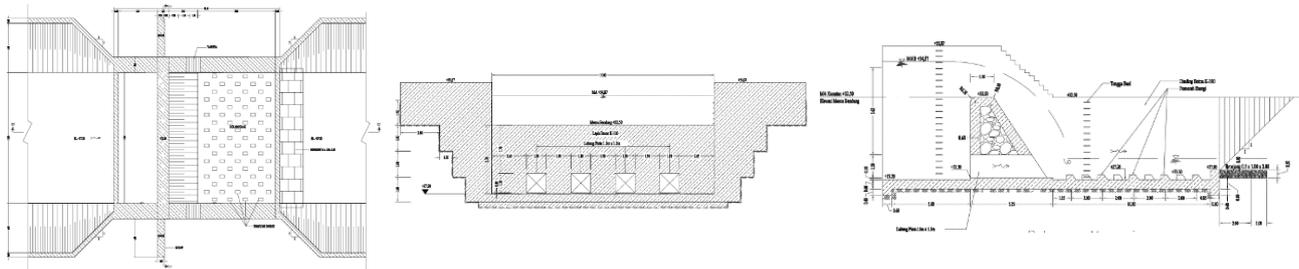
(a) Lay out (b) cross section (c) long section of dry dam
